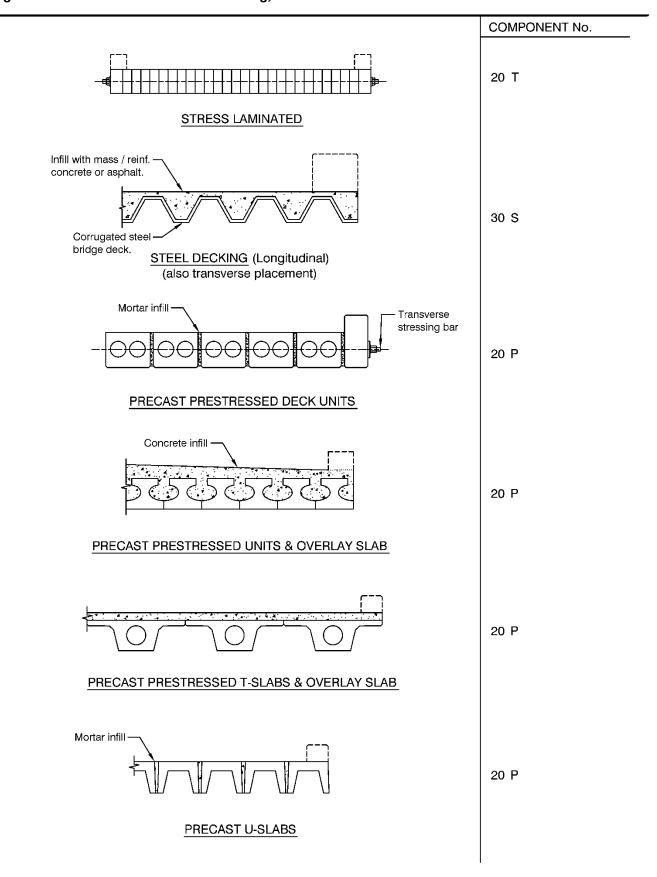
DECKS/SLABS & STEEL DECKING. SHEET 1 of 2
